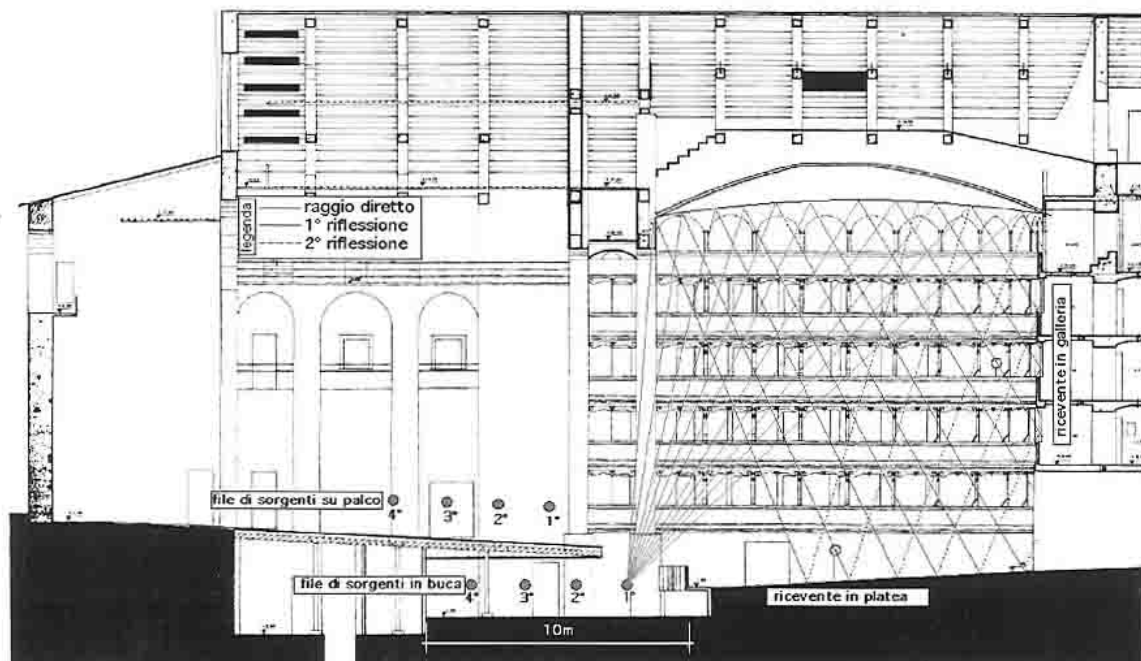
Geometrical construction of sound rays starting from the front pit and received in the stalls with the ceiling modified
